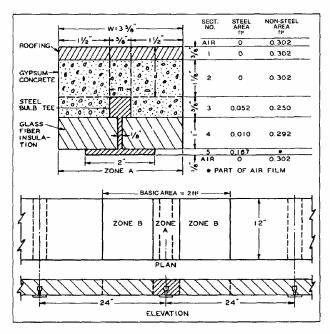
Gypsum Roof Deck on Bulb Tees (Example 4)
